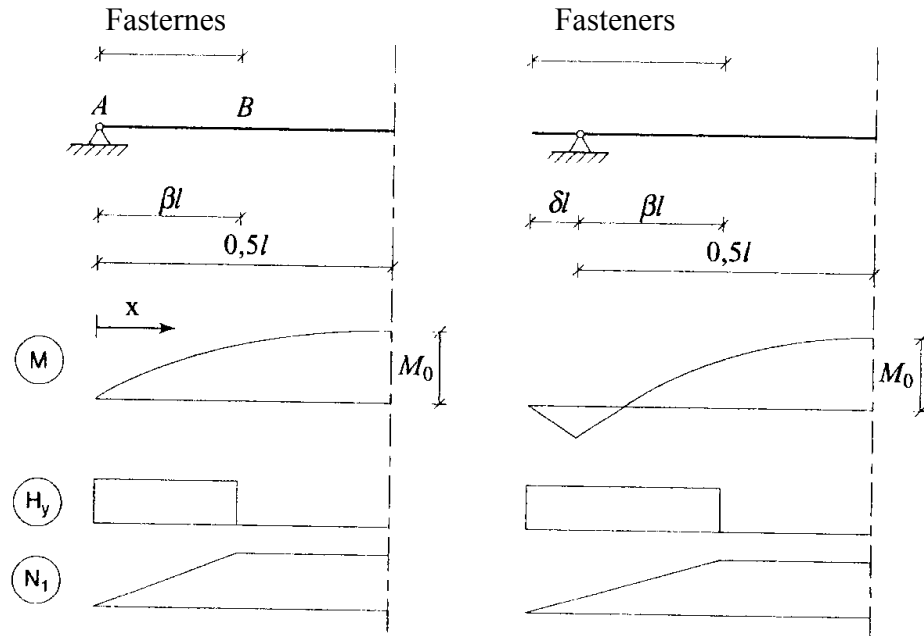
Simply supported beam with constant uniformly distributed load and plastic fastener over the length βl (left) or $(\delta l + \beta l)$ (right).
